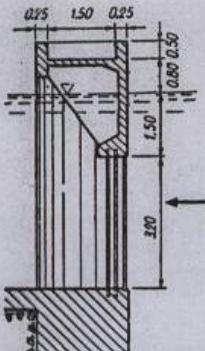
/24. Combined skimmer wall and coarse rack. Pernegg power station, Mur River, Austria
